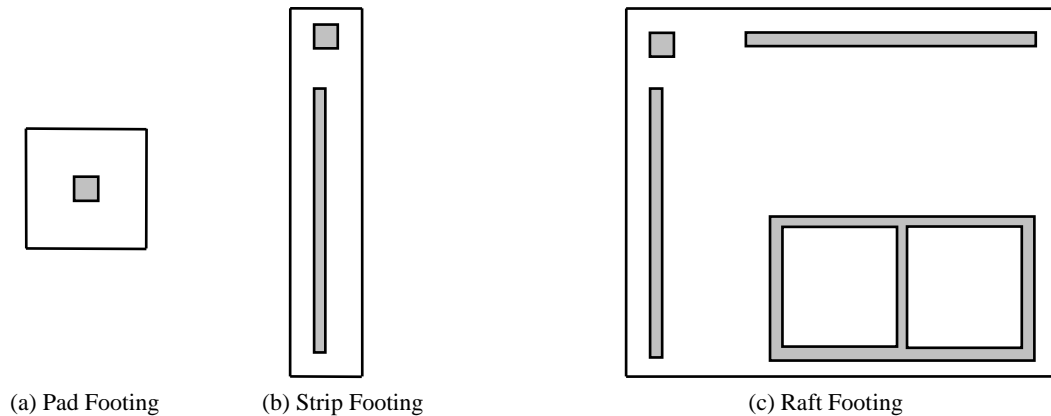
Plans showing Pad Footings, Strip Footings and Raft Footings
